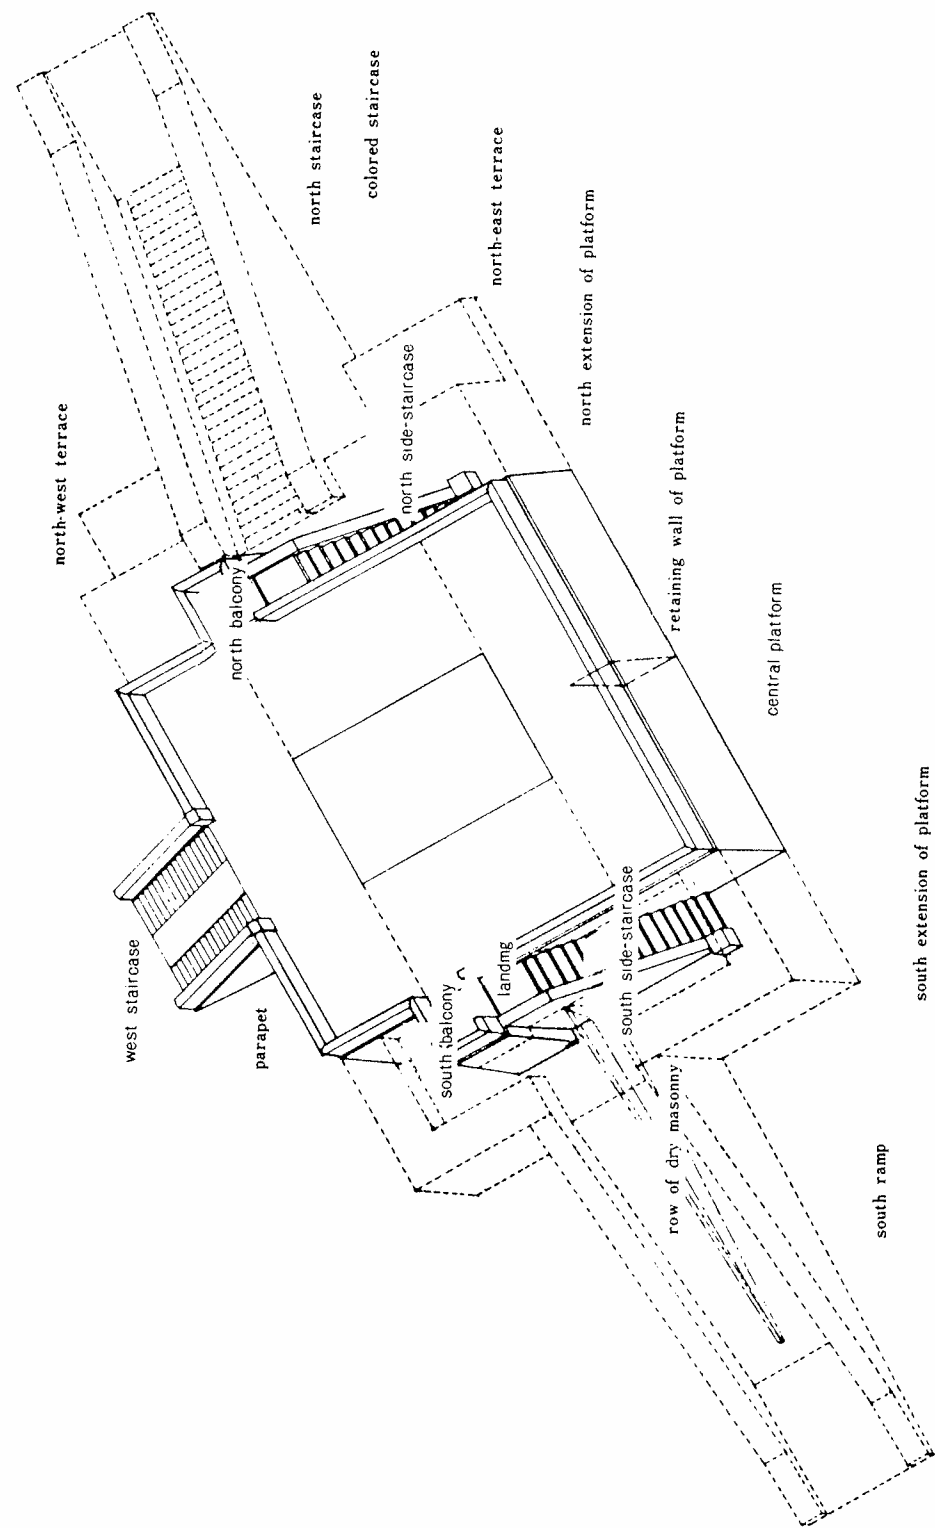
Rough Sketch of Building of Kom el-Samak.
